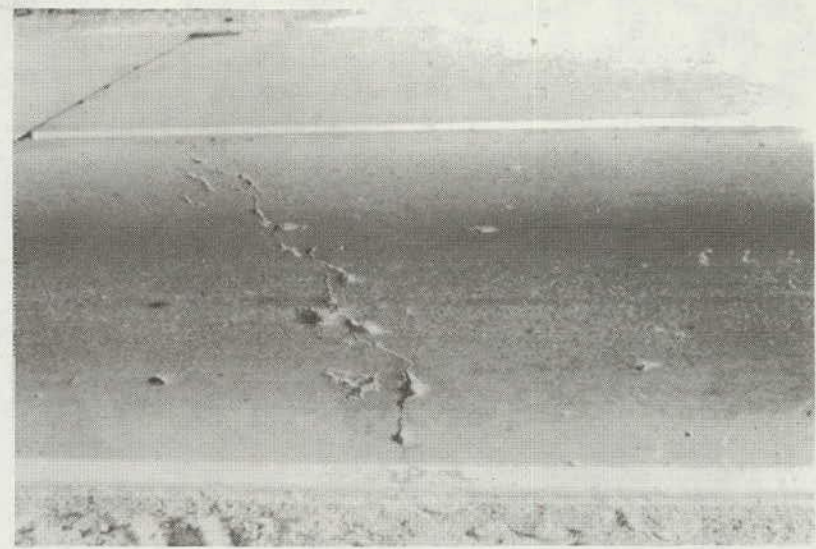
Medium-Severity Diagonal Crack (crack is tight even though it has some low spalling)
